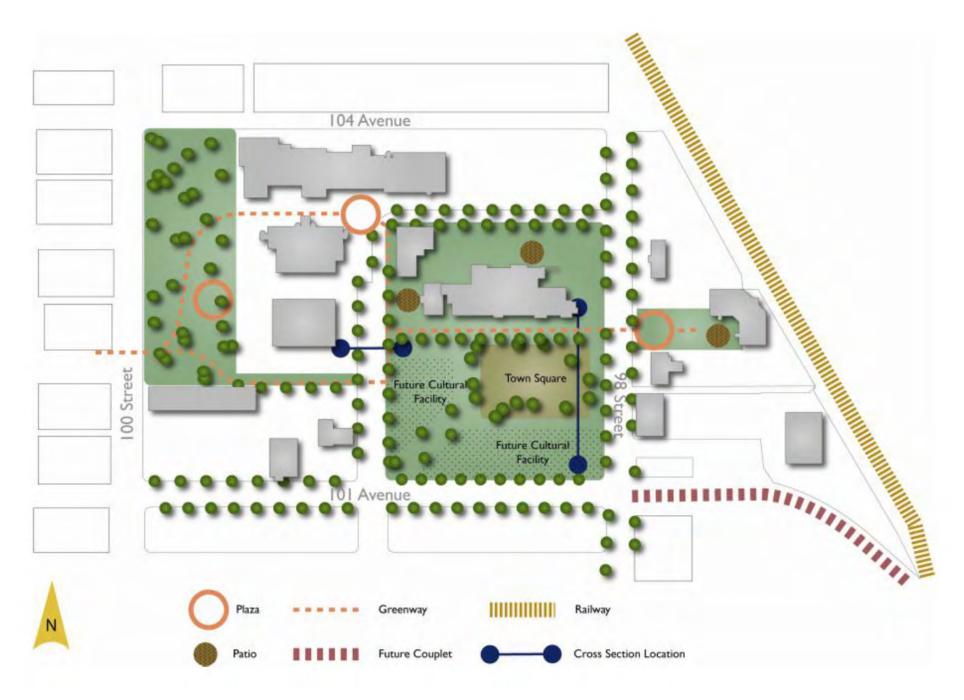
Rendering of South Montrose Site Plan within the Context of the Surrounding Area (Downtown Enhancement Plan, 2004) [NTS]
